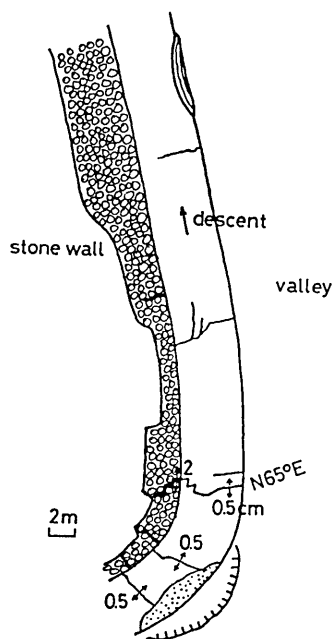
Cracks across an asphalt pavement and retaining wall at Loc. g (east of Ogawa).
